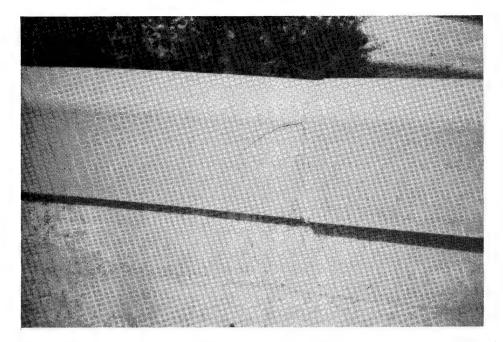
Cracks at joints in parapet wall caps, Deadwood Dam
